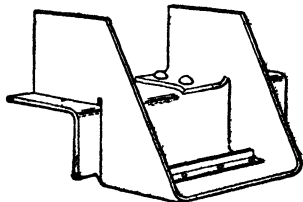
Duplex Wall-hanger for Large Wooden Girder
